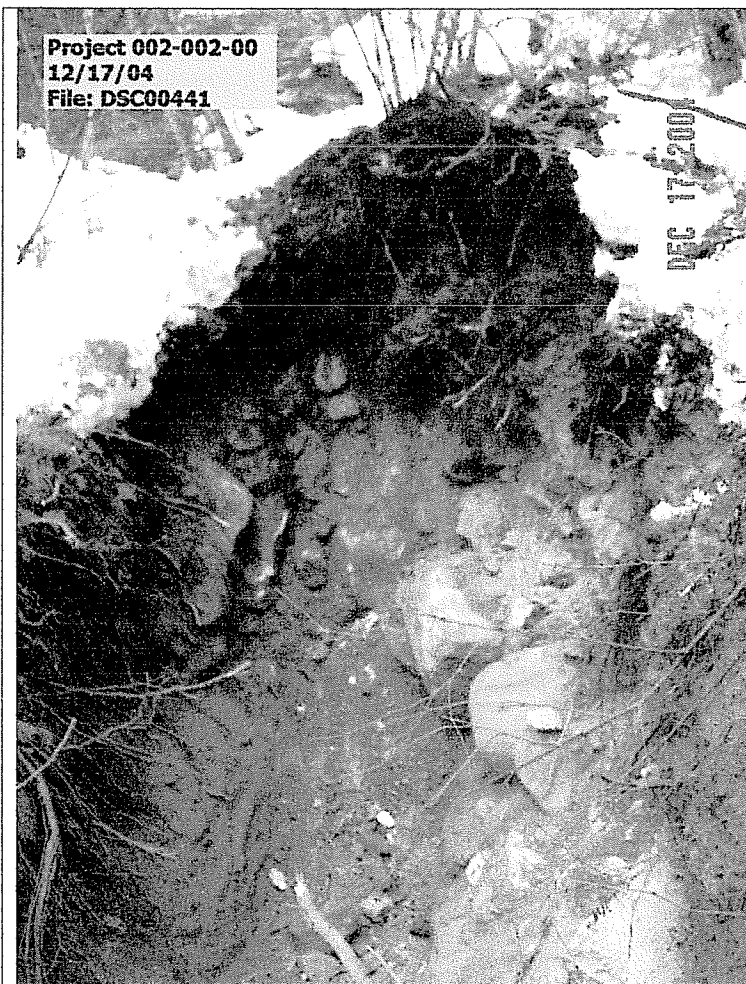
Excavated material from upper 4 feet of test pit exploration. Soil consisted of a dense, brown, moist, cobbly Sand (med-crse) with trace silt.
